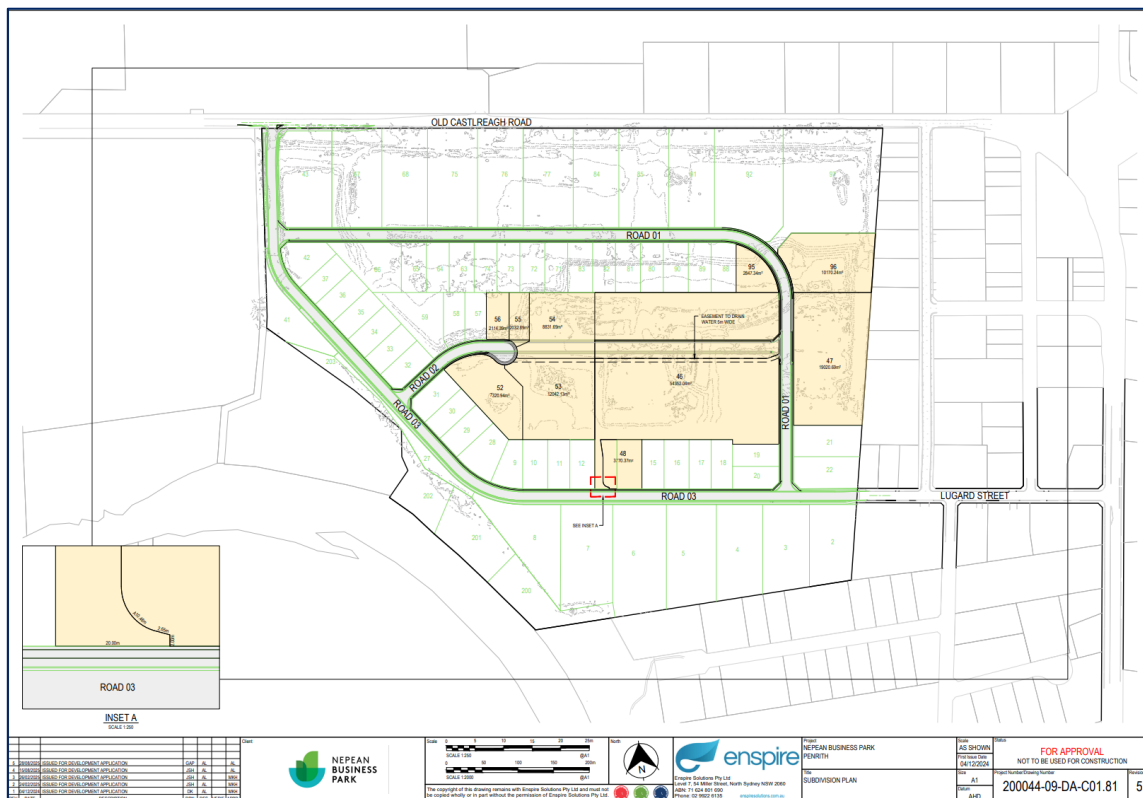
| Proposed subdivision plan (Source: Subdivision Plan)
